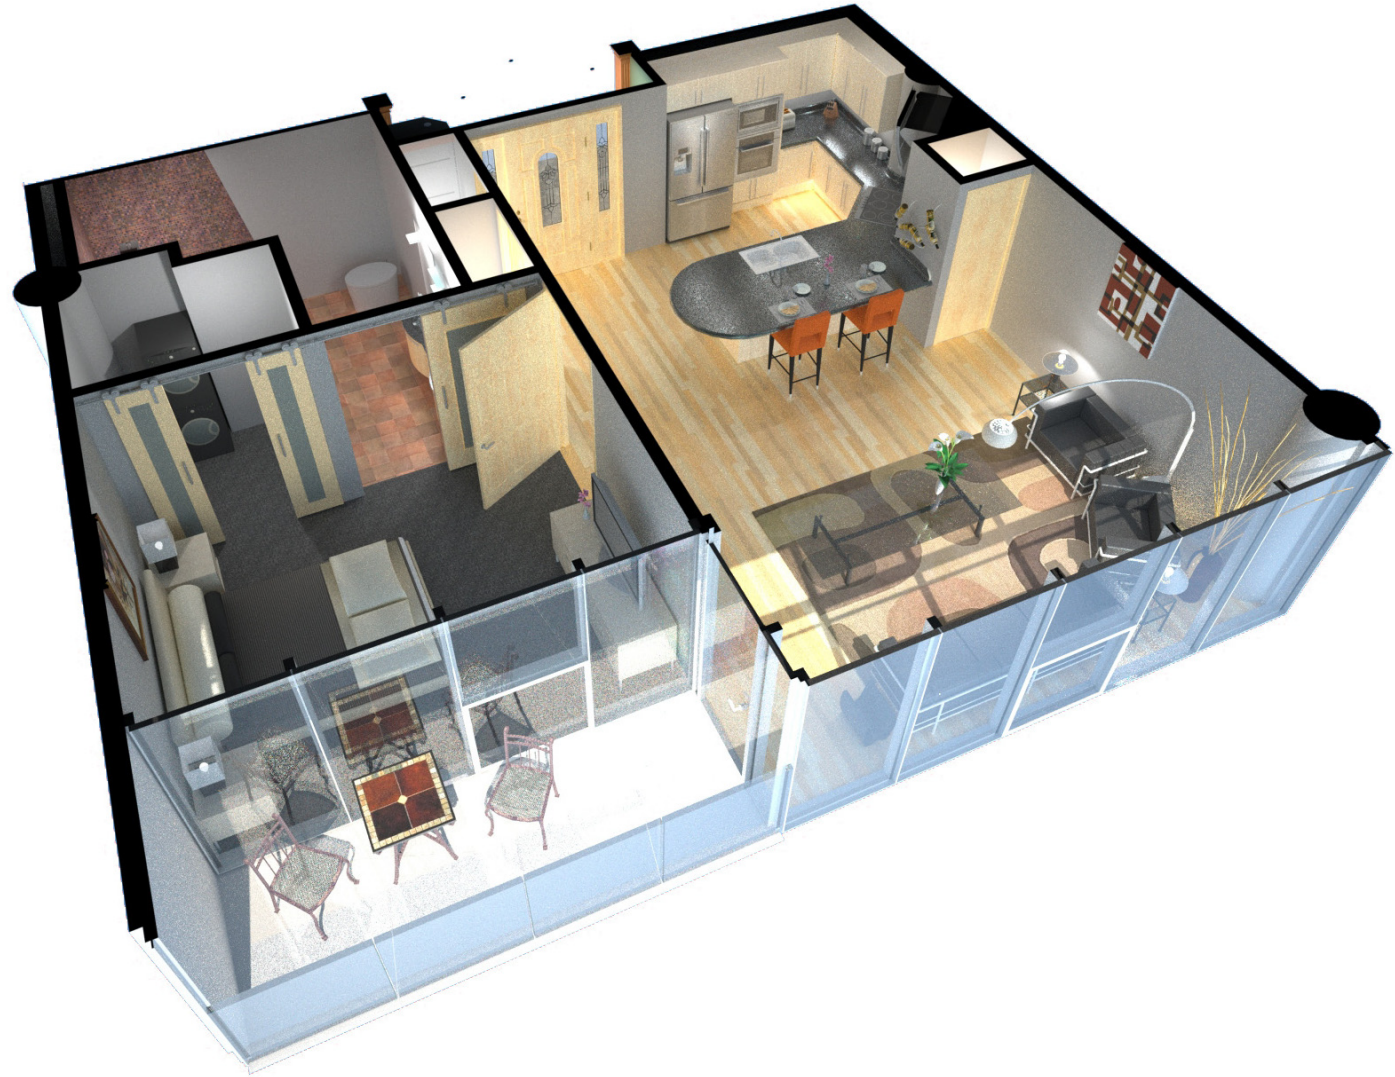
One Bedroom Unit - 3D Floor Plan
